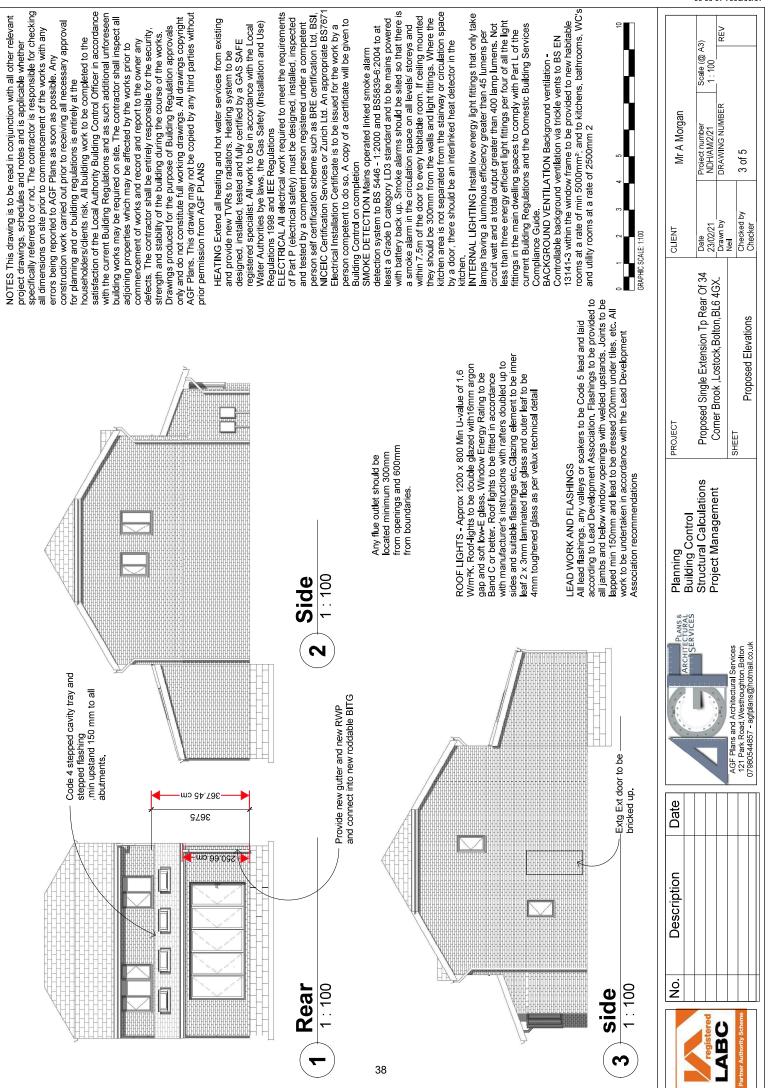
of 5 - Proposed floor layout, dated 23/02/21; and Drawing No. 3 of 5 - Proposed Elevations, dated 23/02/21.
